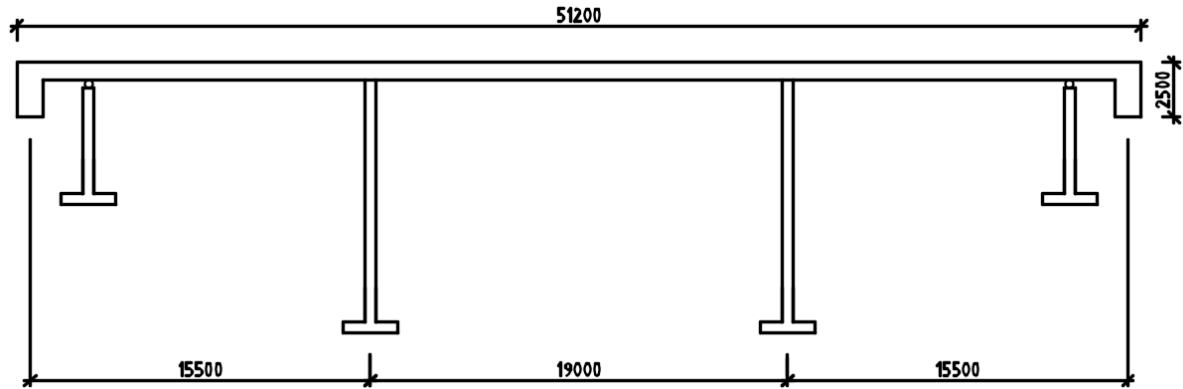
Elevation of the semi-integrated bridge, including measures.
